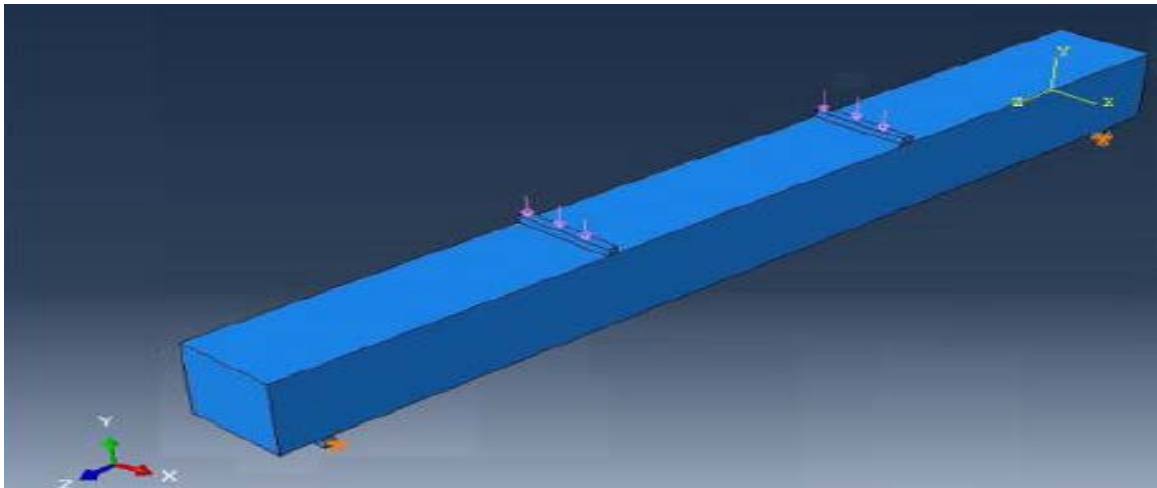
The Loading and boundary conditions of foamed concrete beam
